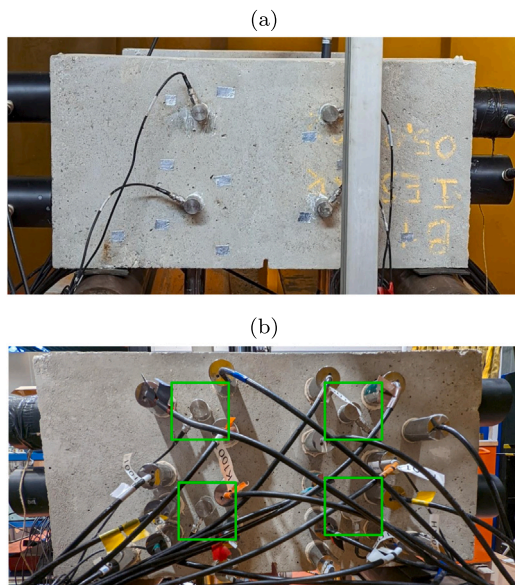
AE transducers at front face (a) and rear face (b) face of inspected beam.
